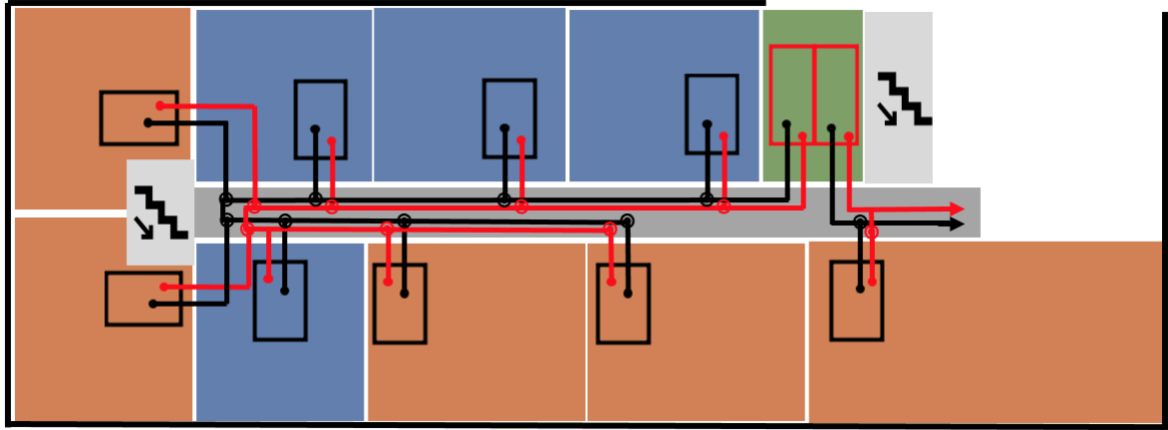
Network connection between dwellings within a floor and across floor. Black and red circles indicate where pipe cross floors
